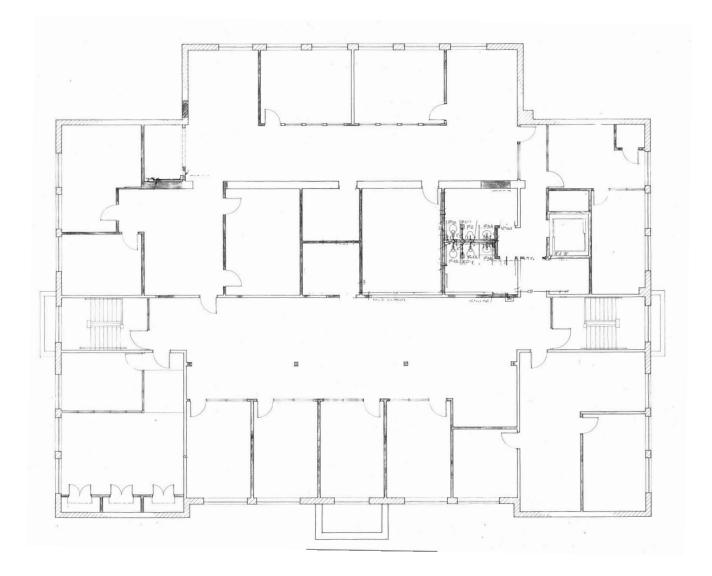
third floor plan, existing (Killis Almond & Assoc. 1993)
